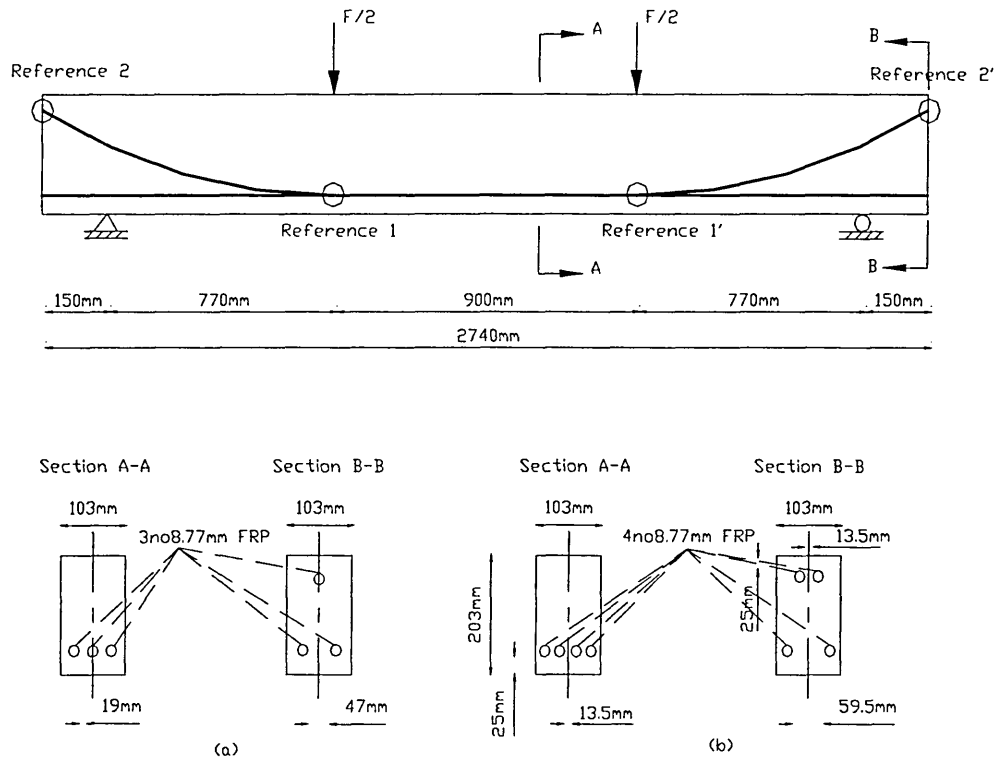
Details of the beam reinforced with 3 & 4 straight & curved profile GFRP rebars
